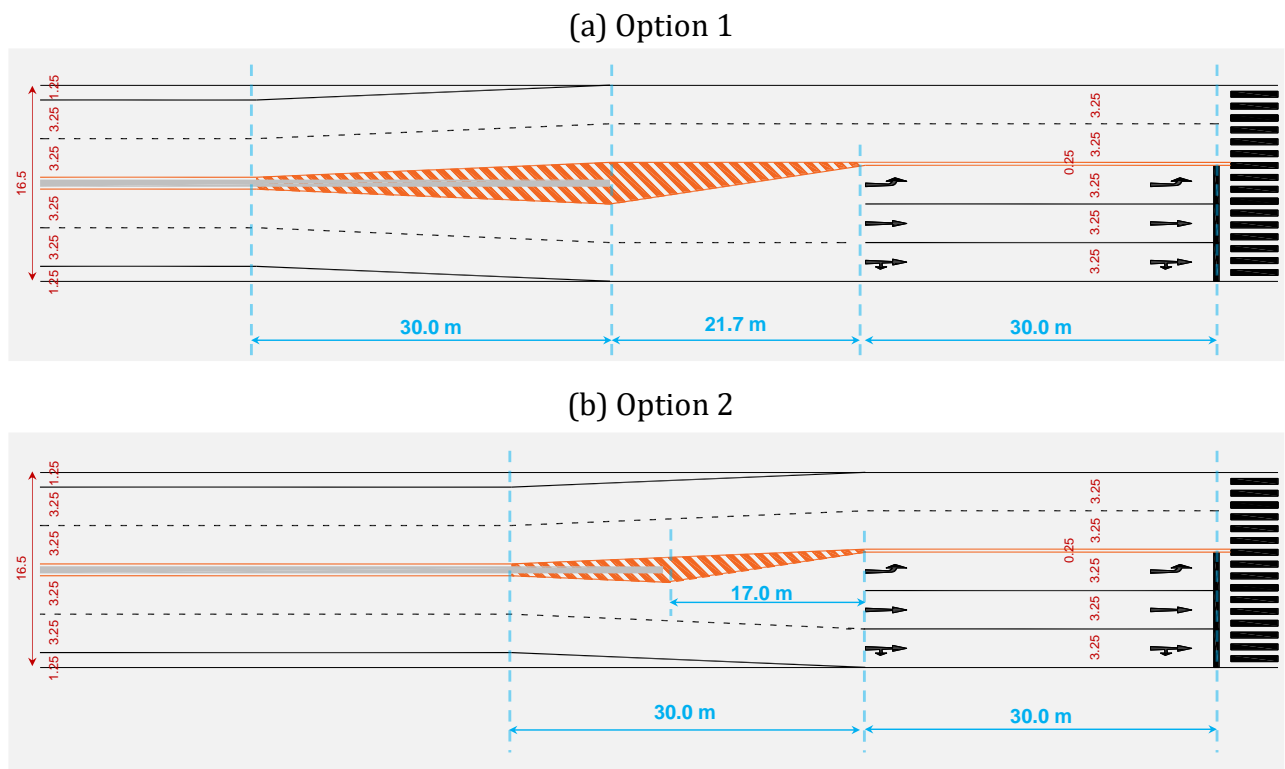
Proposed Intersection Geometry Improvement Plan for Intersection #165
